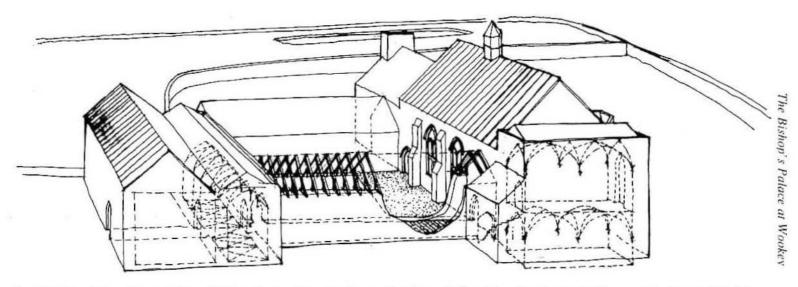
View of the palace as seen in c.1500 from the top of the church tower, looking south. From left to right, chapel and offices range abutting a vaulted cloister. Centre, the north range, a later cloister, to which a first floor of lodgings was added by 1557. Beyond, an internal courtyard with stables range forming the south side by 1557. Right, a vaulted solar of great chamber above a vaulted undercroft with the medieval hall running south into a kitchen block. To the south a close wall, with fishpond and moat beyond.
